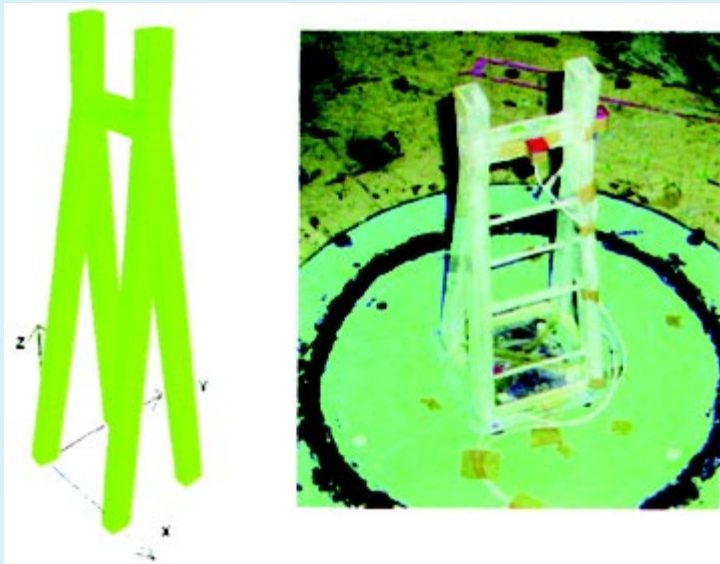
Wind tunnel experiment on a bridge pylon model
